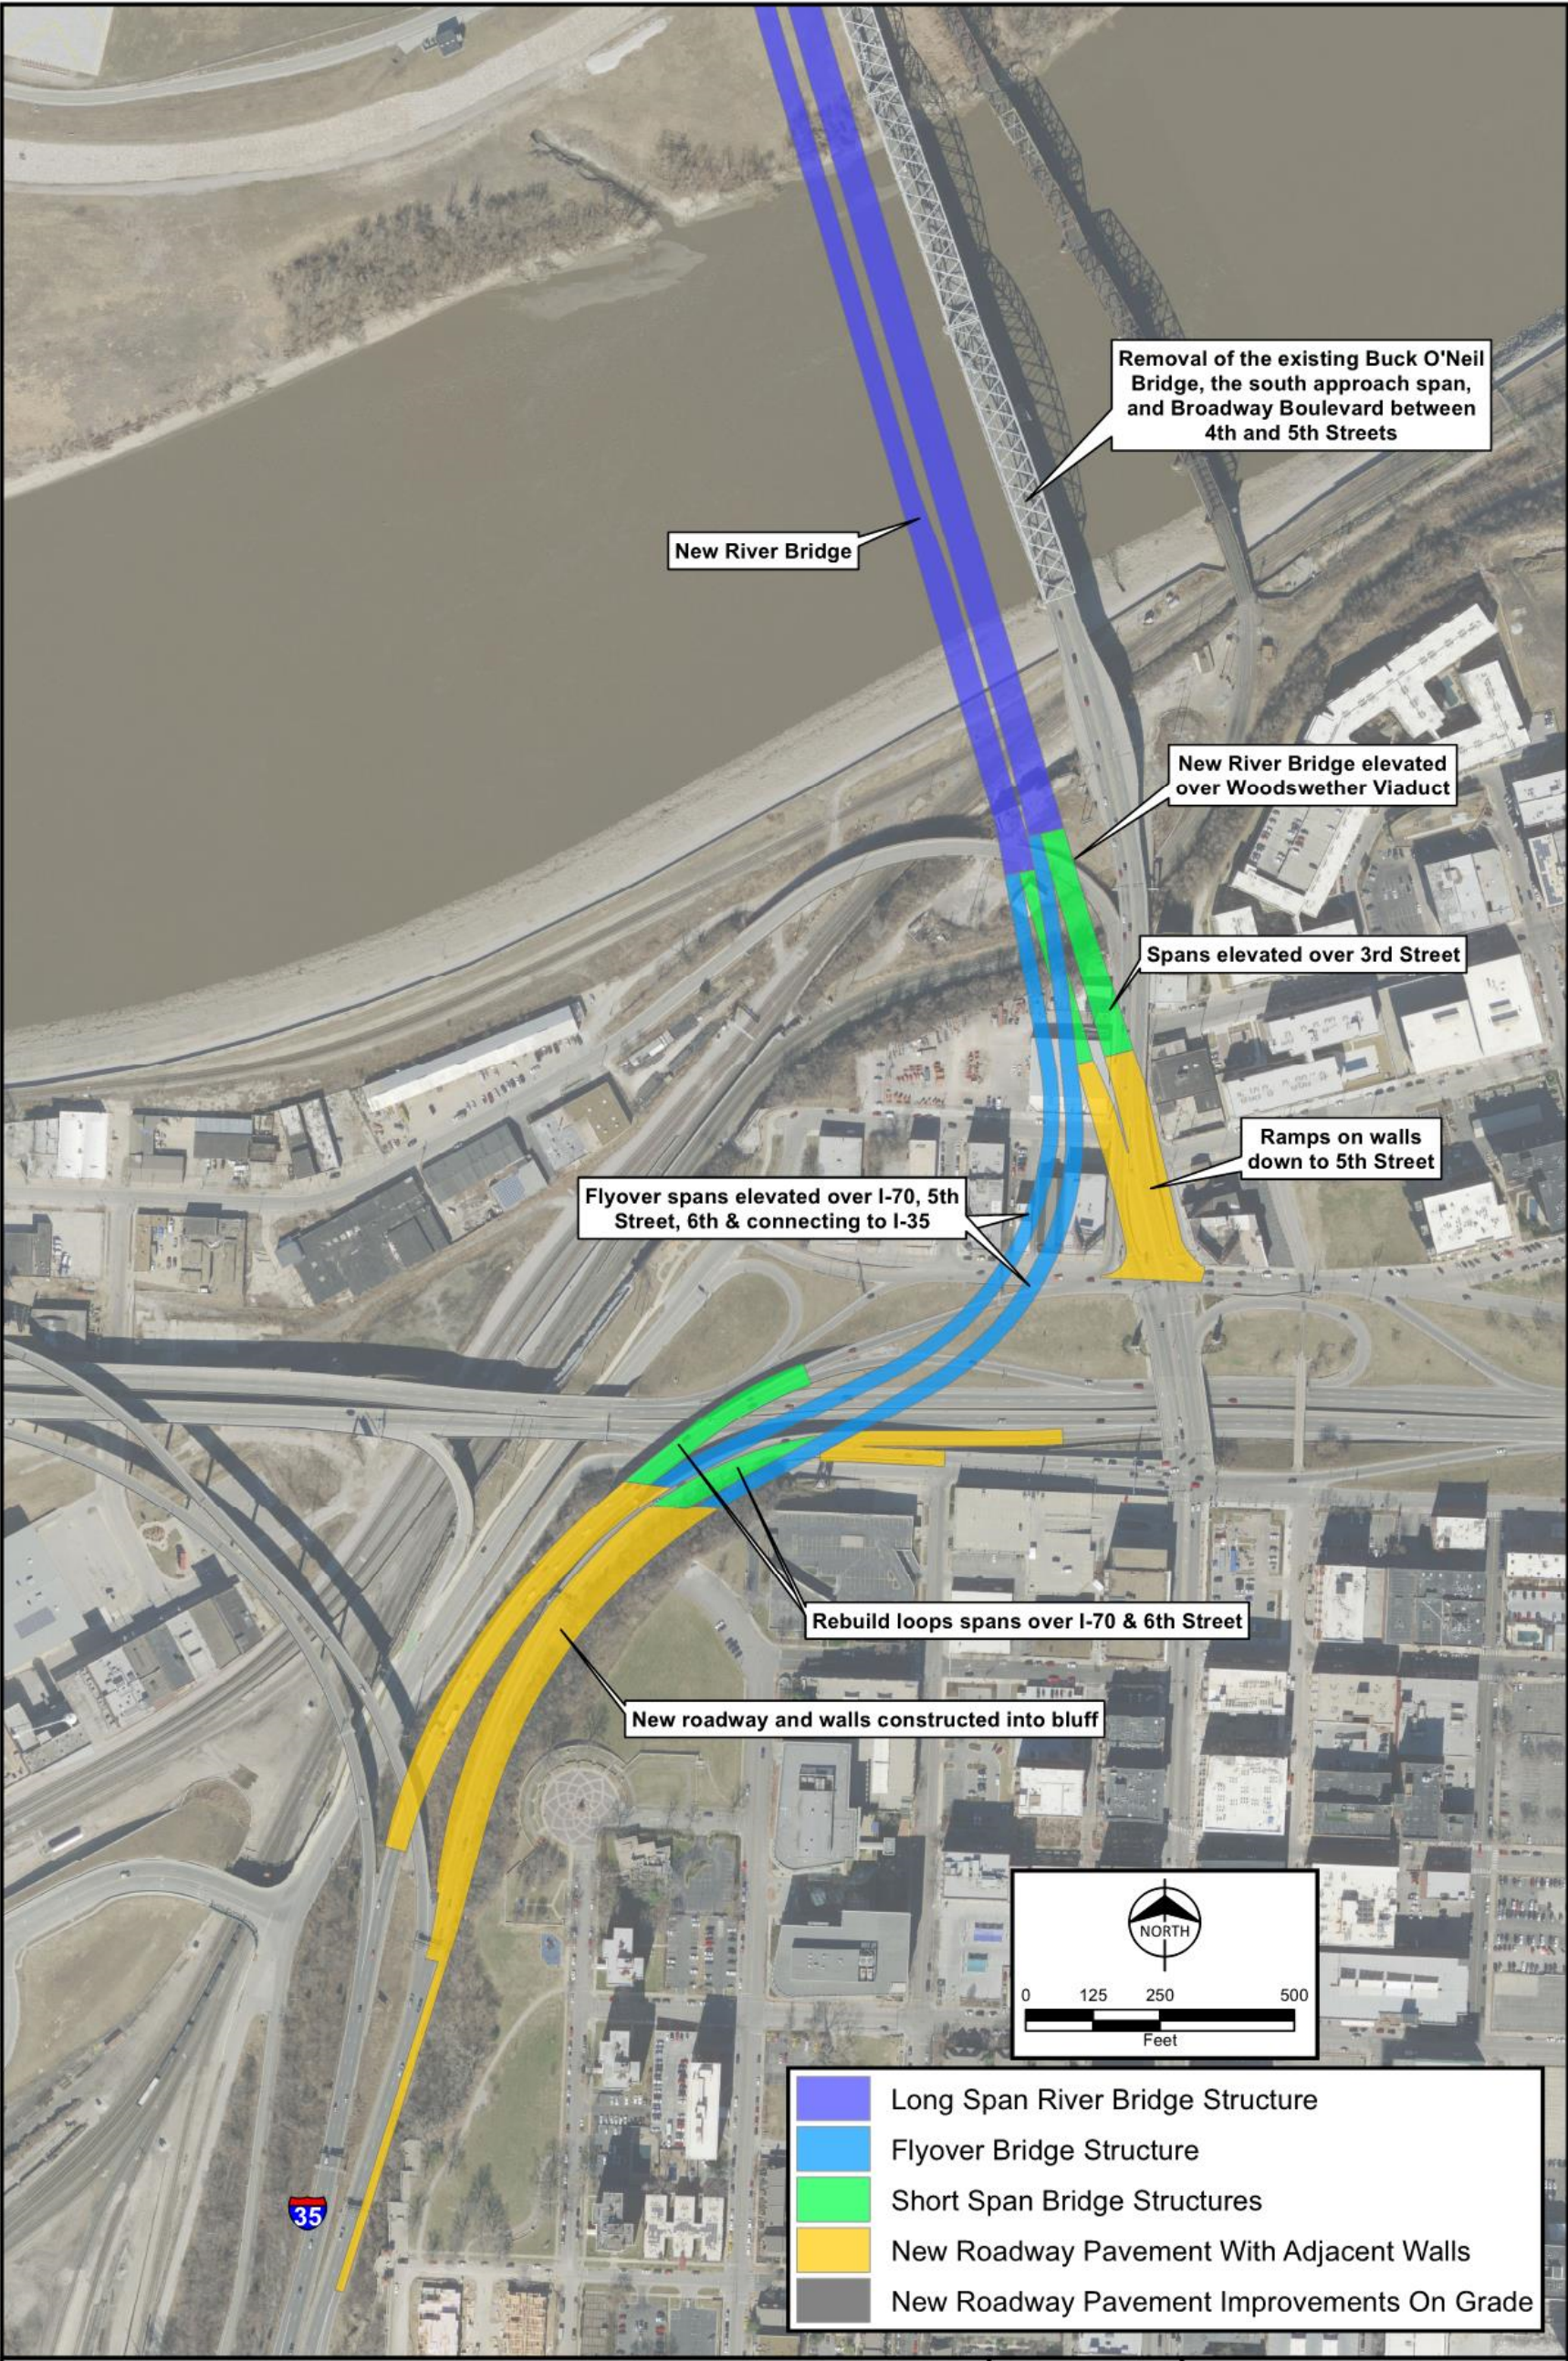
Adjacent Alternative –Bridge Alignment and South Segment Improvements
